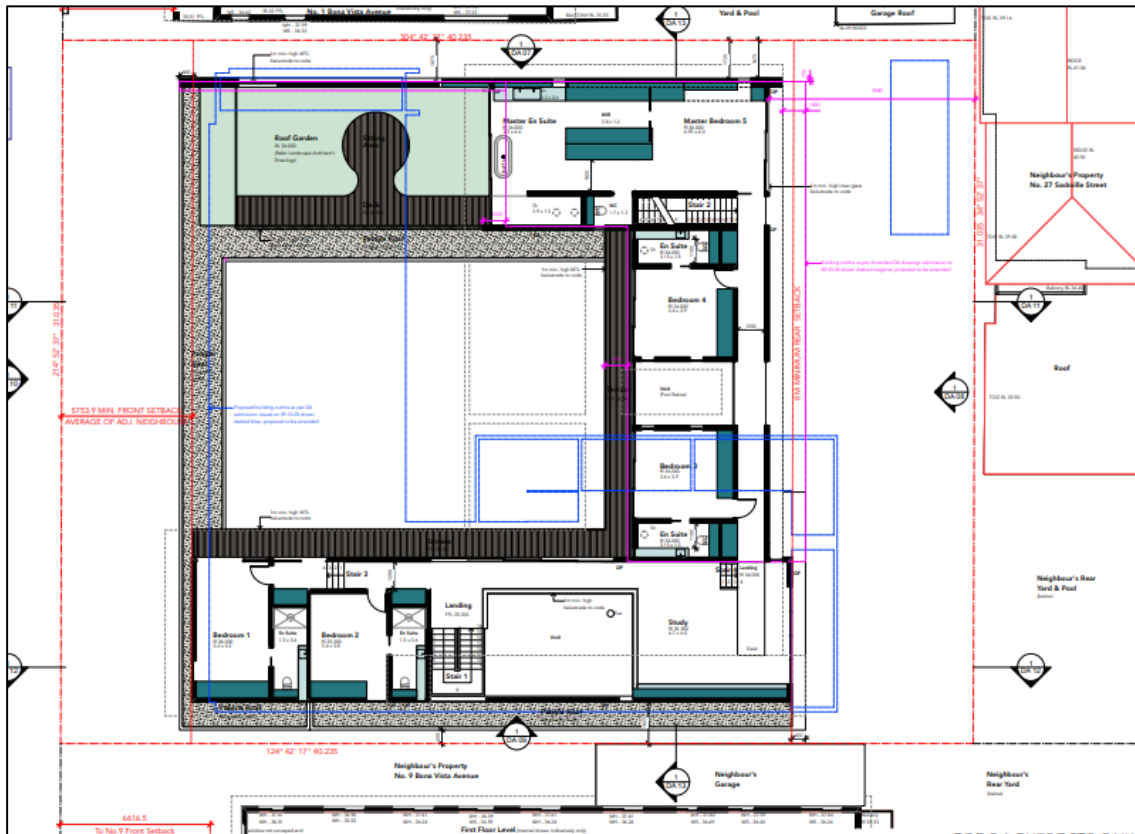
First Floor Plan of subject Development – 3-7 Bona Vista Avenue (Source: Dominic Levene)
